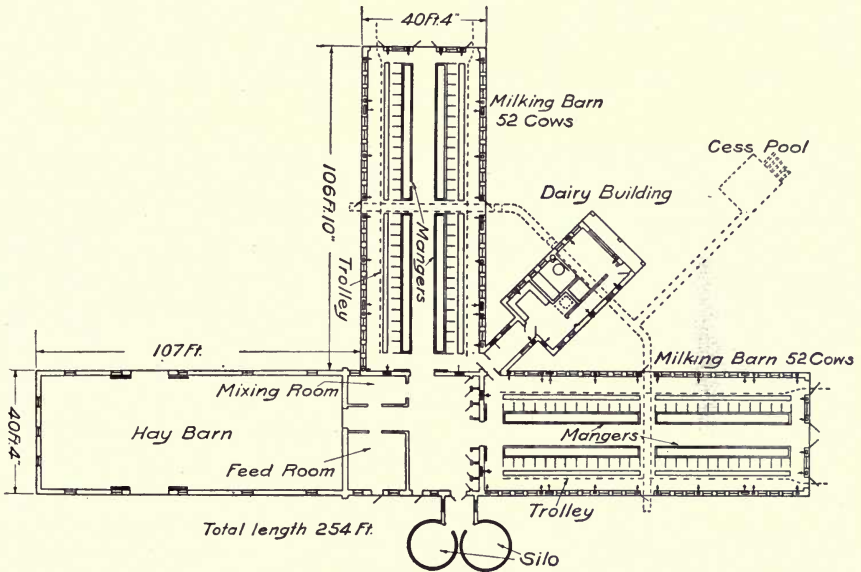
Plan of the Farm Building at the New York Catholic Protectory, Somers Center, N. Y.
